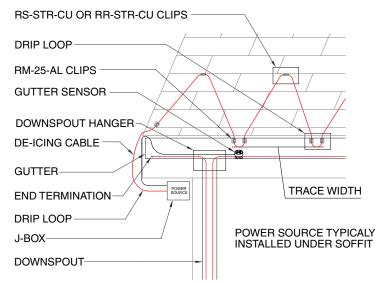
De-icing cable on sloped slate eave only. This layout typically uses RS-STR-CU or RR-STR-CU clips on roof eave and RM-25-AL clips with VHB adhesive pads in gutter. For copper gutters use RM-25-CU clips.
